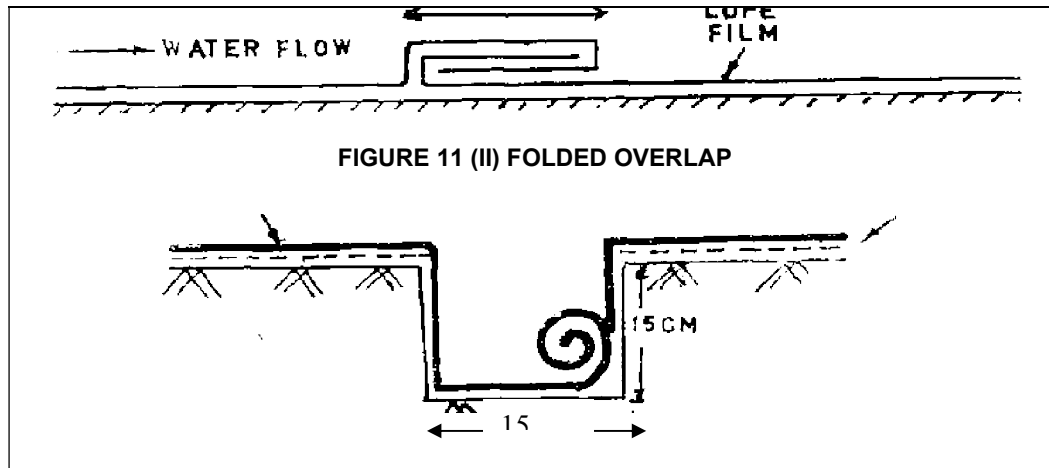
(iii) FOLDED JOINTS EMBEDDED IN A TRENCH TO FACILITATE LINING
